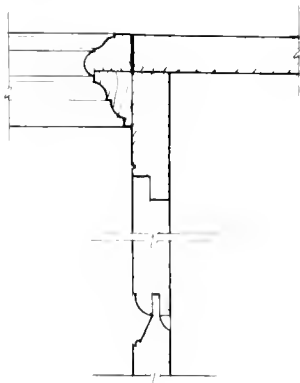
Plan Section Section showing how the horizontal beaded boards are mortised, tenoned and pegged into the surrounding stile.
